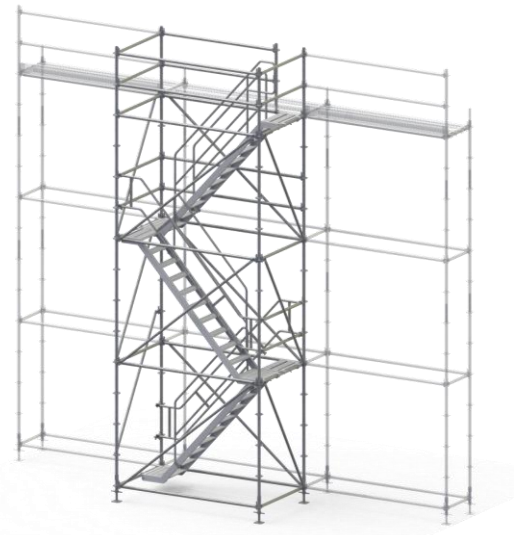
Steel stair tower 8 leg 1,09-2,57-1,09*2,07*2,0m
